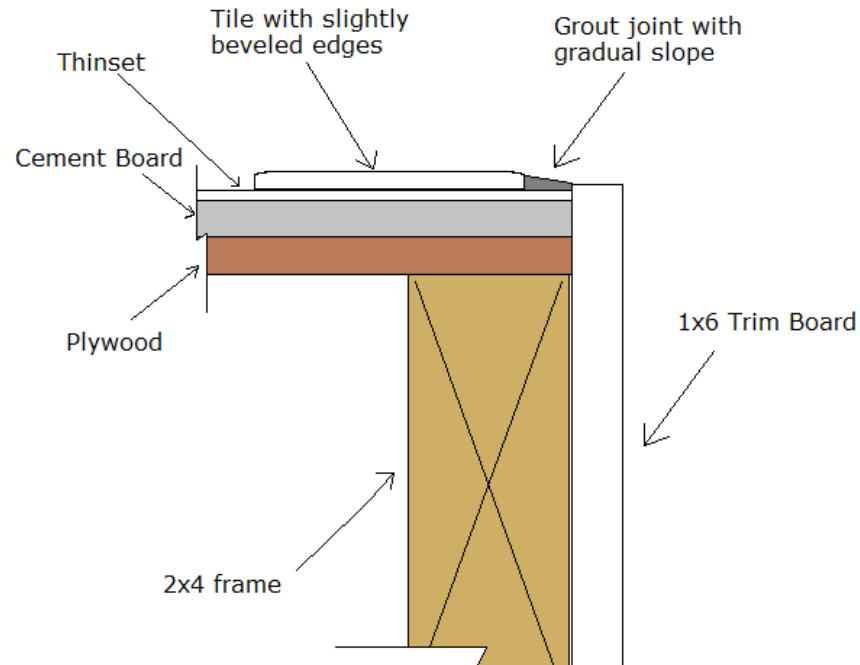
Side cut, showing slight bevel of outer grout joint that connects to the trim.
